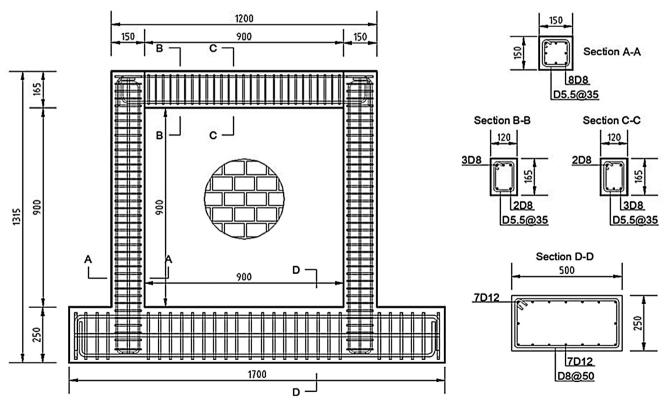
Geometry and reinforcement of test specimens (dimensions in mm).
